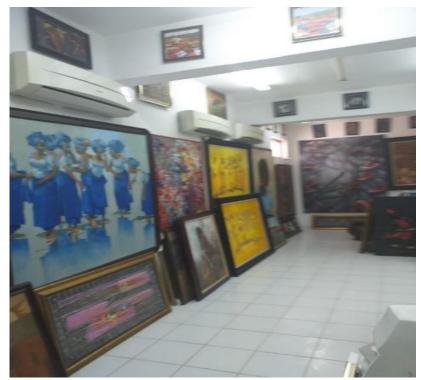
Air conditioning units used in Nike art gallery, Lekki, Lagos Source: Author's fieldwork (2021)
